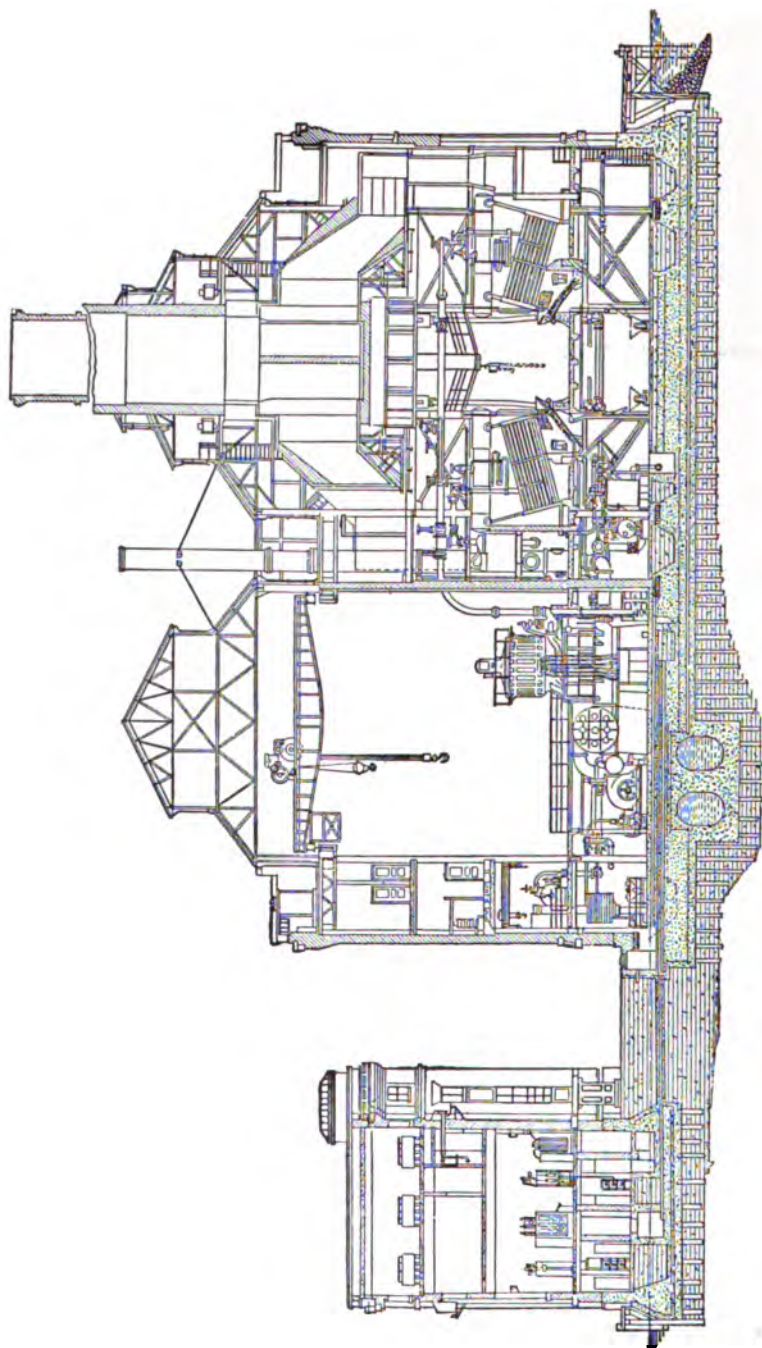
Cross-Section of "Yonkers" Plant, New York, Switch House at left hand (*Power*).
